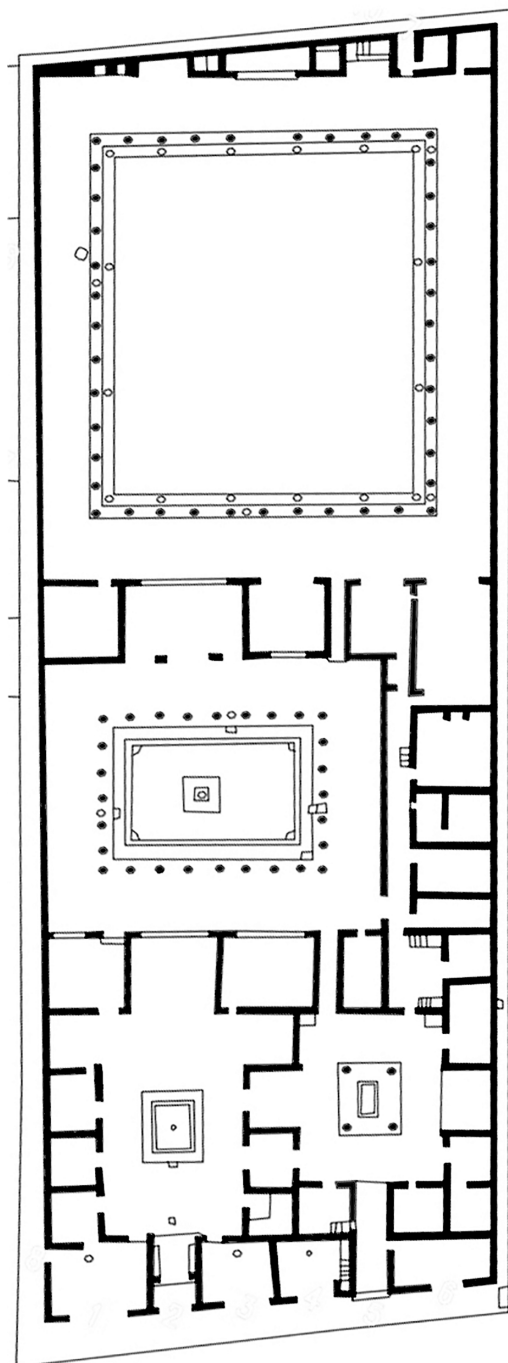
Plan of the Casa del Fauno (VI 12, 2).
